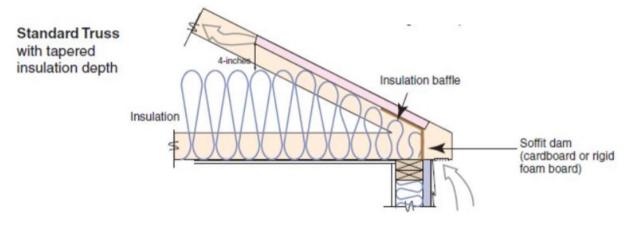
Standard roof trusses are narrow at the eaves, preventing full insulation thickness over the top plate of the exterior walls. Image source: Building America Solution Center [6]
